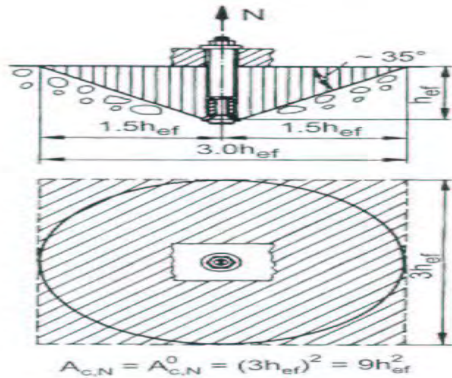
Concrete cone failure surface (idealised) (after Fuchs, Elgehausen (1995))
